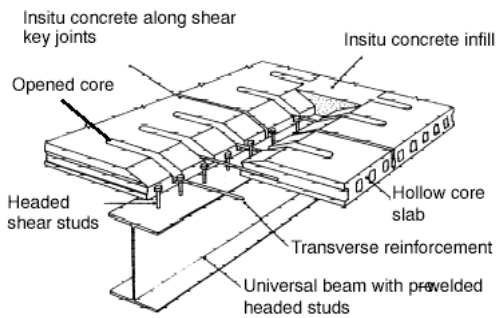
Typical beam connection detail to resist diaphragm action forces
